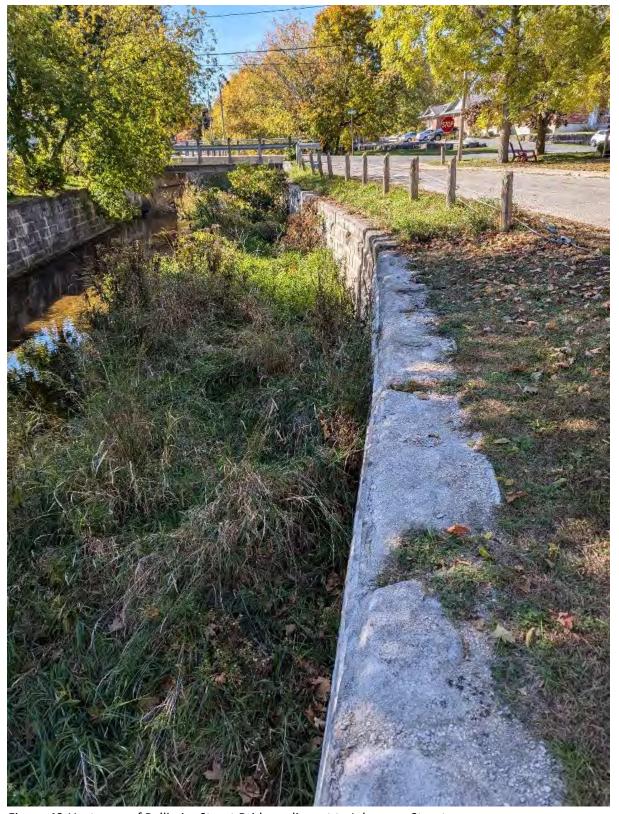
Upstream of Pellissier Street Bridge adjacent to Inkerman Street
